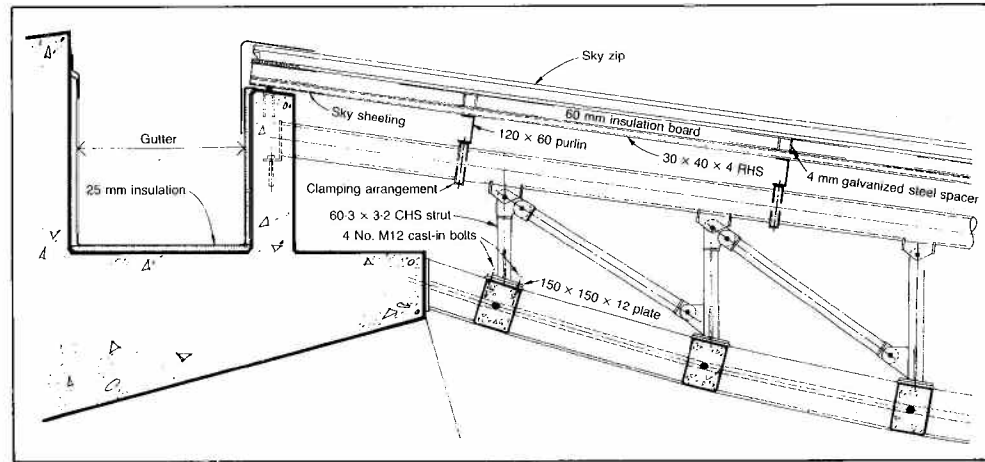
Section through roof construction showing inclined bracing, and side gutters of complex
